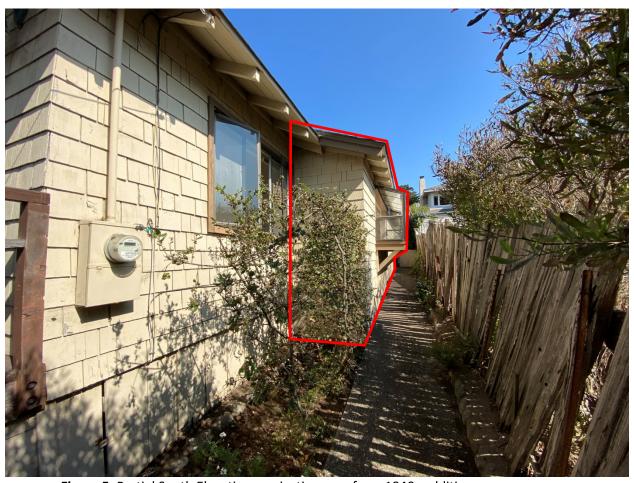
Partial South Elevation; projecting area from 1940s addition.
